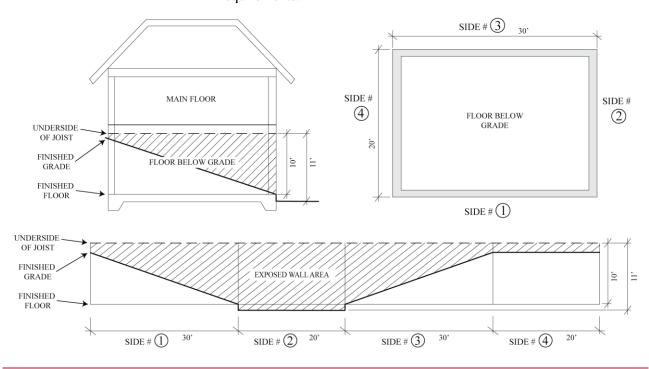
Illustrative example for calculating the floor below grade adjustment
